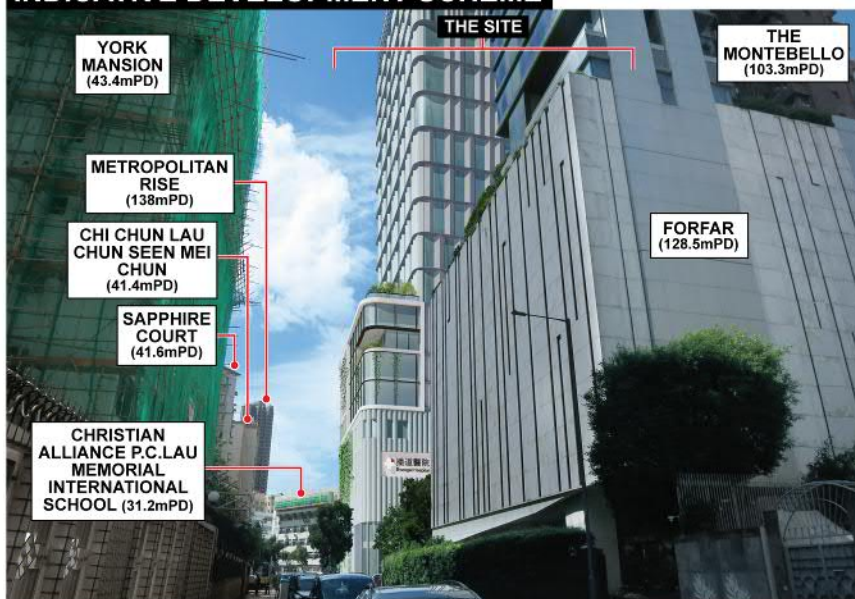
VIEWPOINT 1 : VIEW FROM THE SIDEWALK OF FORFAR ROAD
